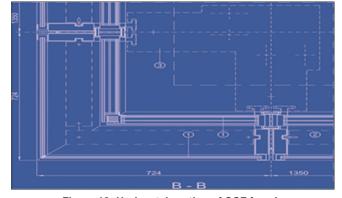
Horizontal section of CCF façade 1-Glasses processed by laminate 2-Aluminum structure 3-Façade support
